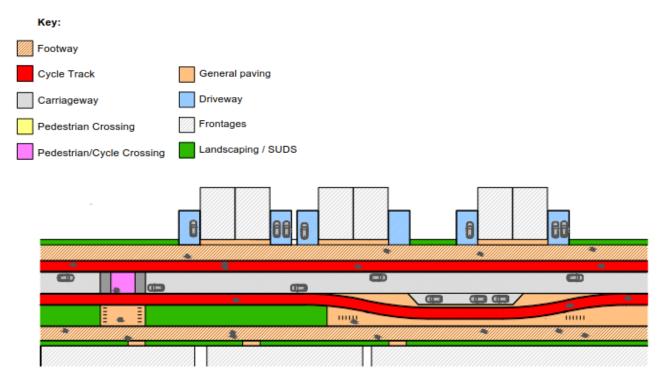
Trapezoidal strip between footway and cycle track
